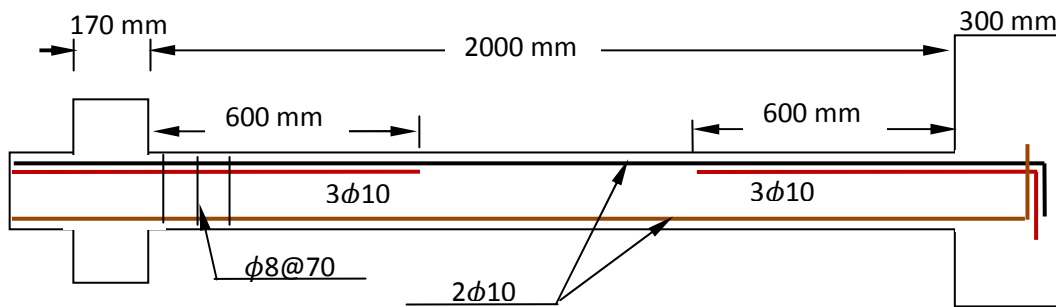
Reinforcement detailing of a two spans reinforcement beam (Sasani and Kropelnick, 2007)
